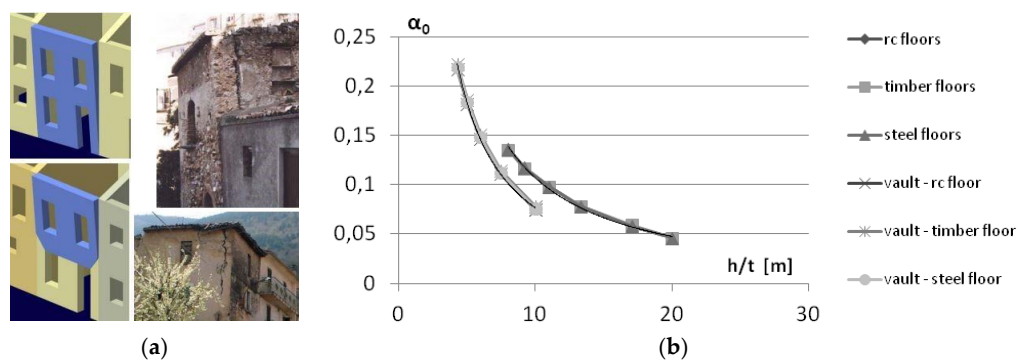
Multipliers related to the building with two storeys: (a) overturning mechanisms, (b) design chart for collapse load multipliers assessment of two-storey buildings.
